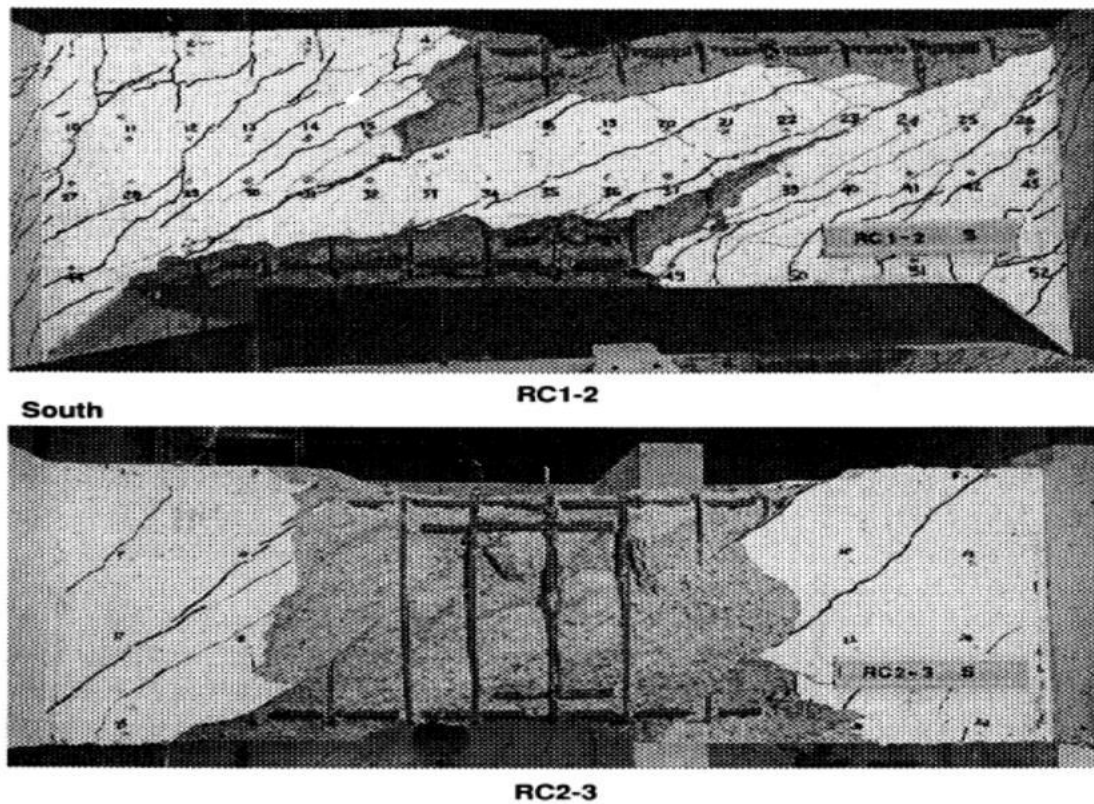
Observed Spalling on south and north faces of Specimen RC1-2 and RC2-3[25]
